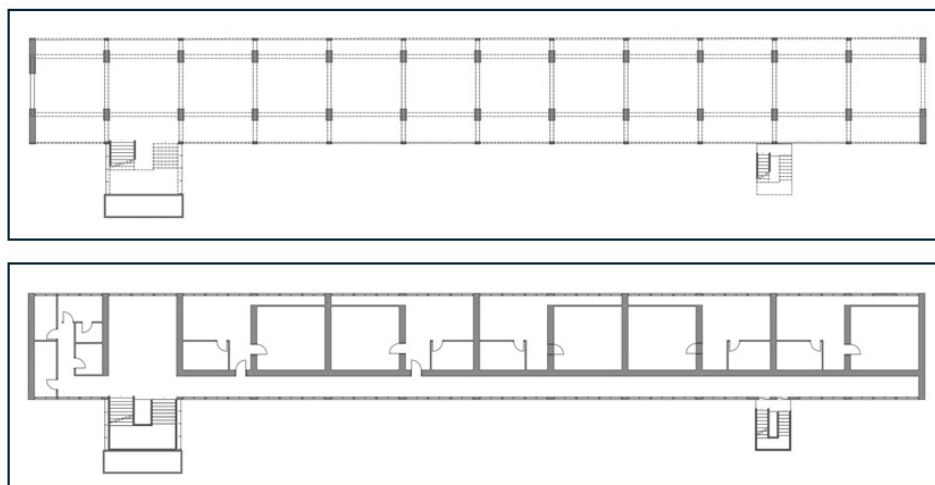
Ground floor and standard floor plans of one of the CRUSP buildings by the authors
